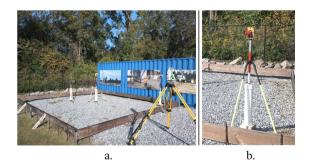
(a.) Simulation Construction Site and (b.) Proxy Plumbing Pipe
